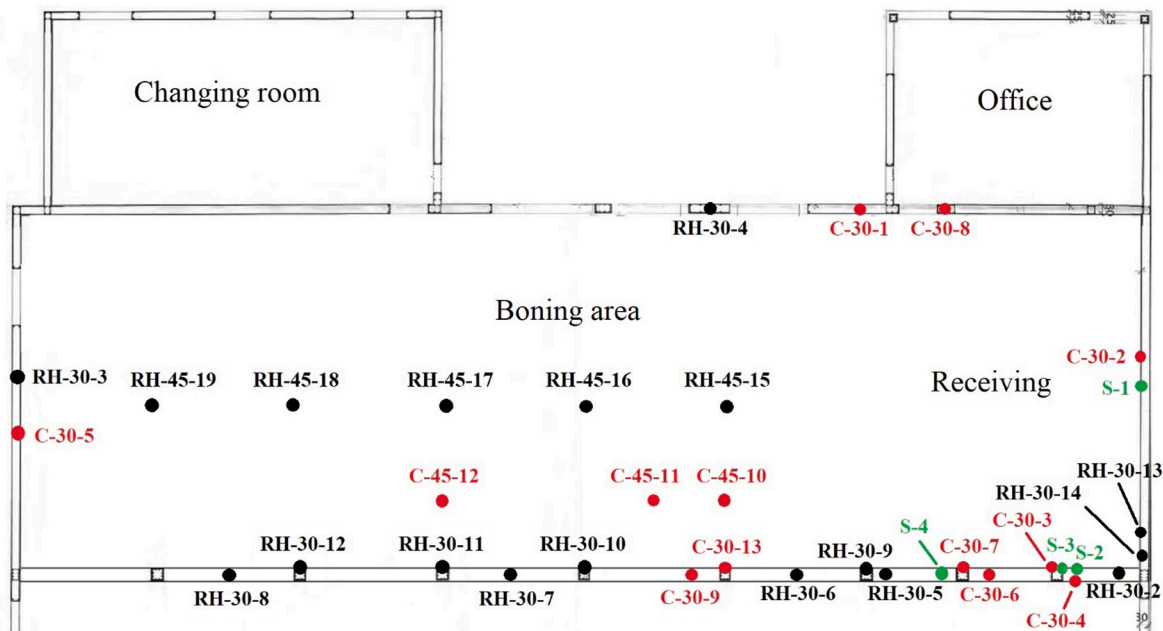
Location of survey spots in the building plan for Rebound Hammer (label RH) surveys, drilled cores (label C) and reinforcement samples (label S).
